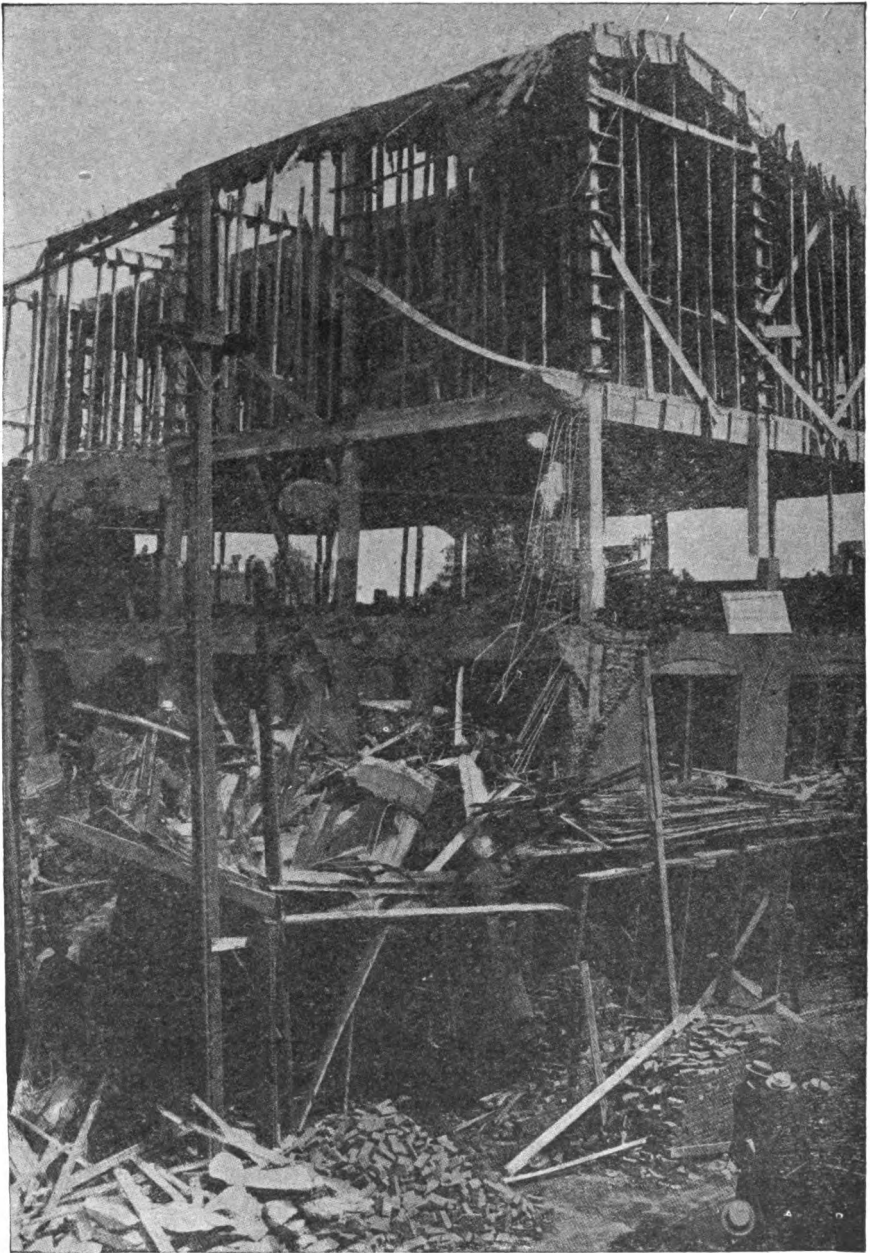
The Collapse of a Reinforced Concrete Warehouse (Philadelphia) while Under Construction
